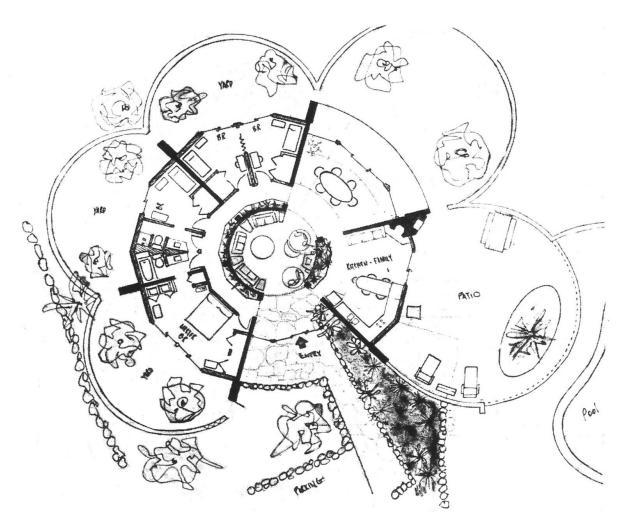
, Harrenstein House Floor Plan, 1963. (drawing by Howard Harrenstein)
